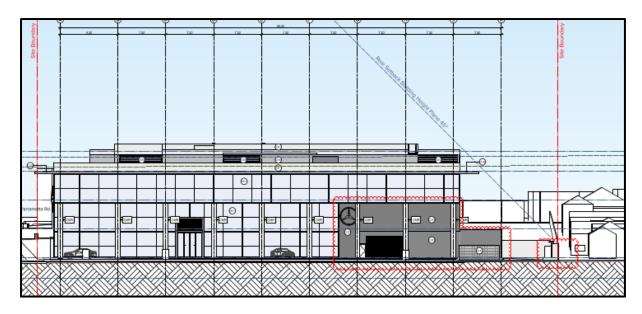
West Elevation demonstrating compliance with the 45 degree height plane to the southern boundary.
